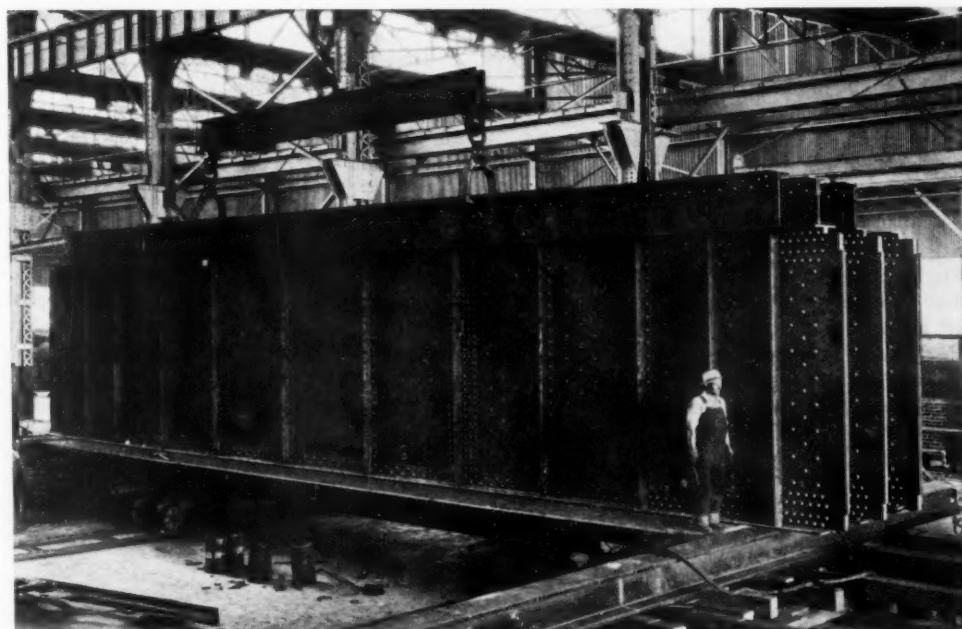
FIRST THREE CROSS GIRDERS SET ON LEVELING BEAMS
